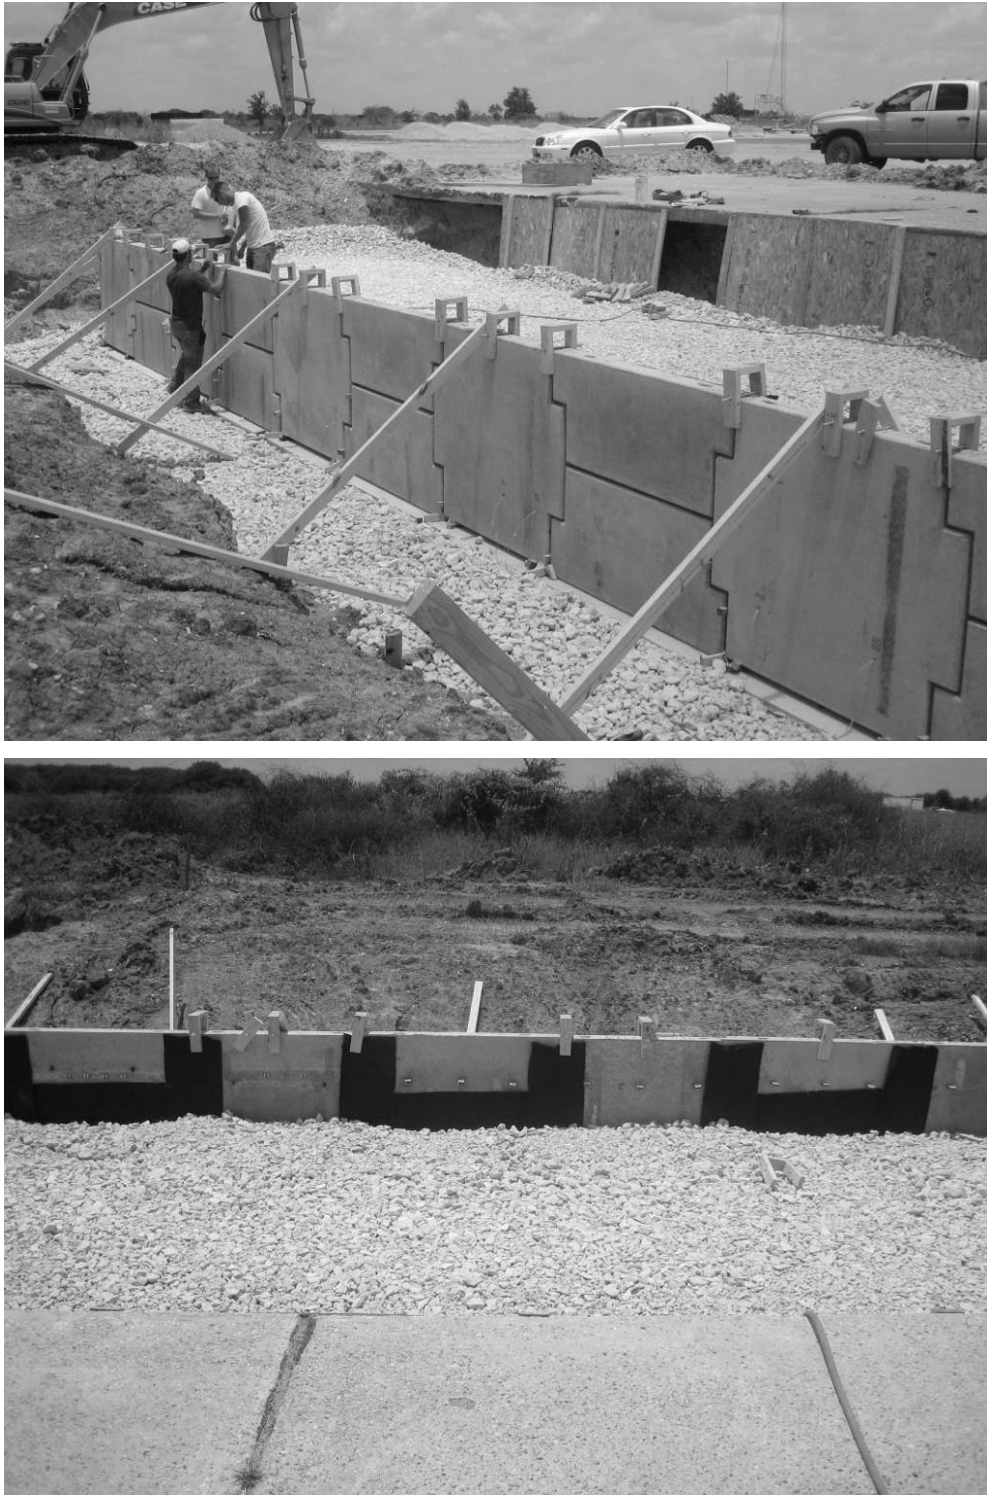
Place Second Course of Panels and Backfill to Top Layer of Reinforcement
